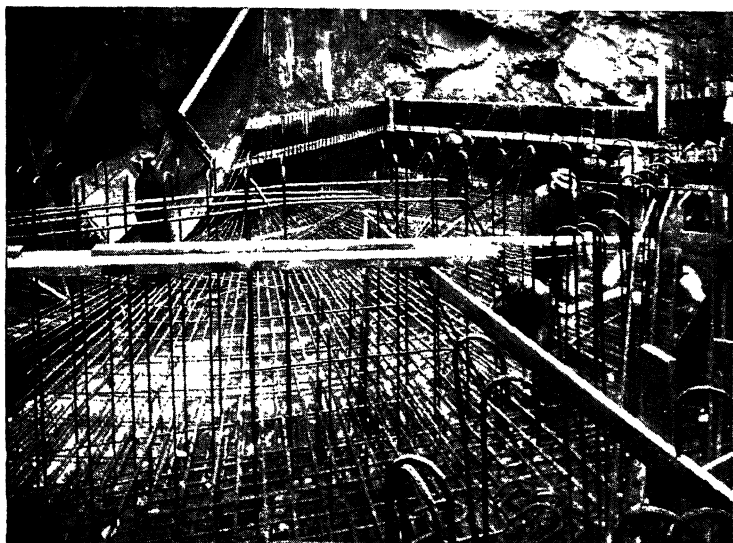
Reinforcement in invert of the New Jersey shaft of the Lincoln Tunnel at New York City.
